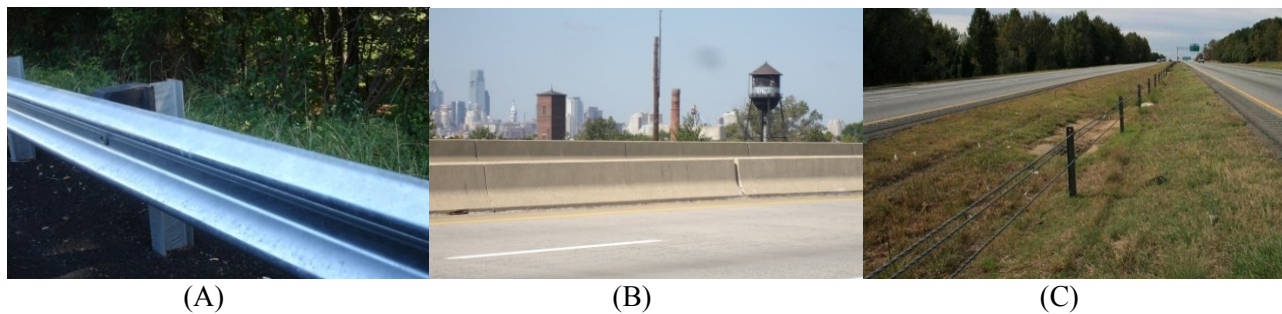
Barrier Types. (A) W-beam Guardrail, (B) Concrete Barrier, (C) Cable Barrier
